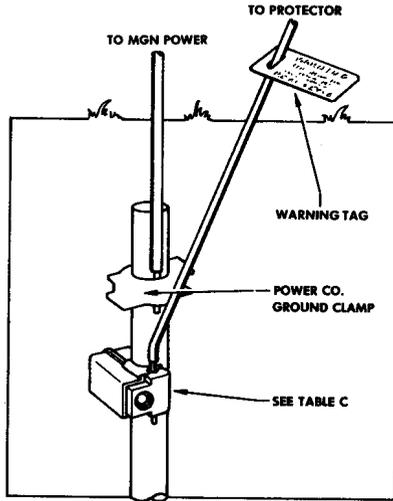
MGN Power Grounded to Ground Red—No Water Pipe—Connection to Pipe Not Possible
